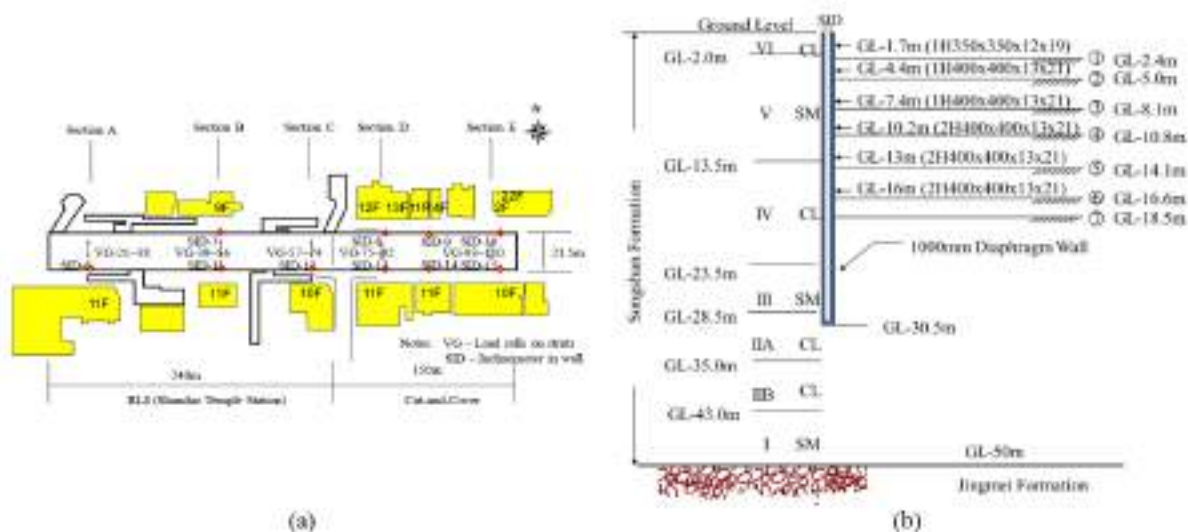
Shandao Temple Station (a) site plan and (b) excavation scheme (Hwang et al. 2012)
